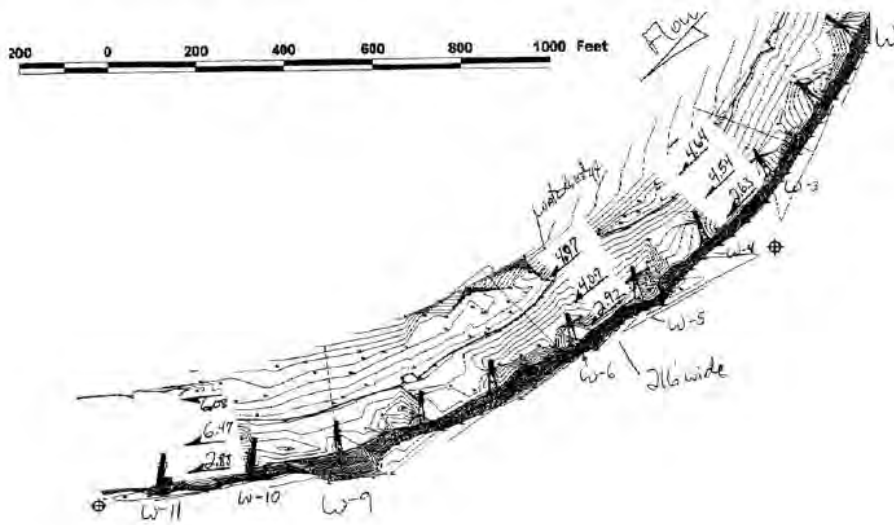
Example layout for series of bendway weir structure (NEH 2007)
